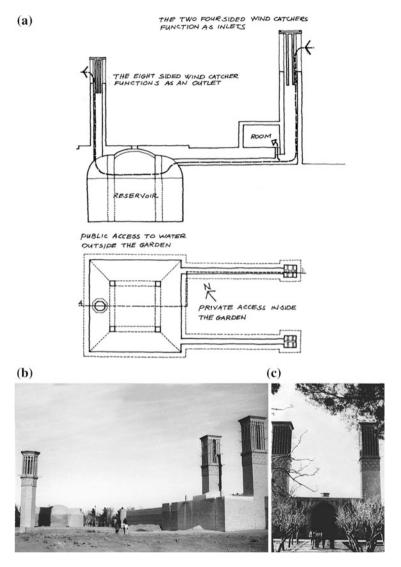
Nain. Water reservoir of Musalla: a Plan and section showing structure and airflow pattern. b External view. c Private entrance from inside of the garden
